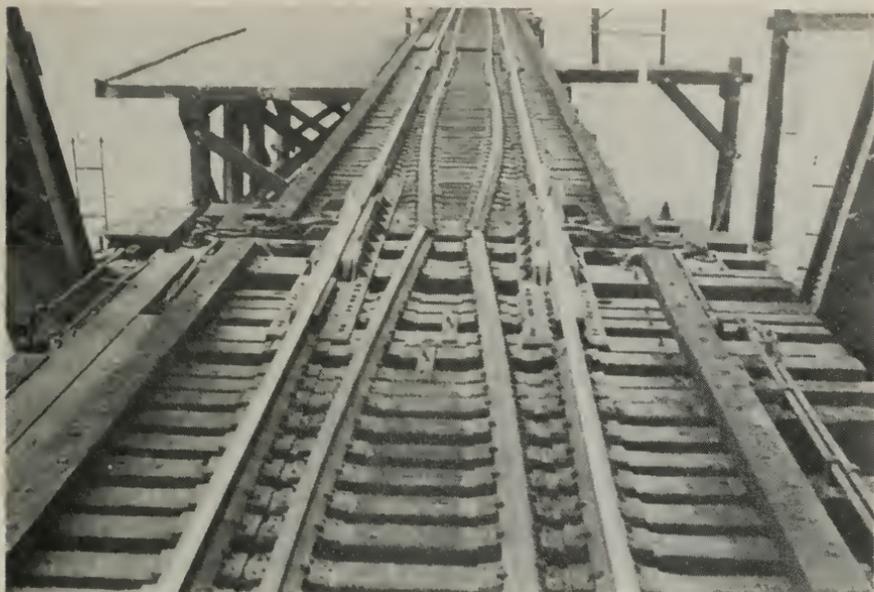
Southern Railway Bridge over Lake Pontchartrain, New Orleans, La., showing rail lock at drawbridge in foreground and rail expansion joints for continuous welded rail in background.
